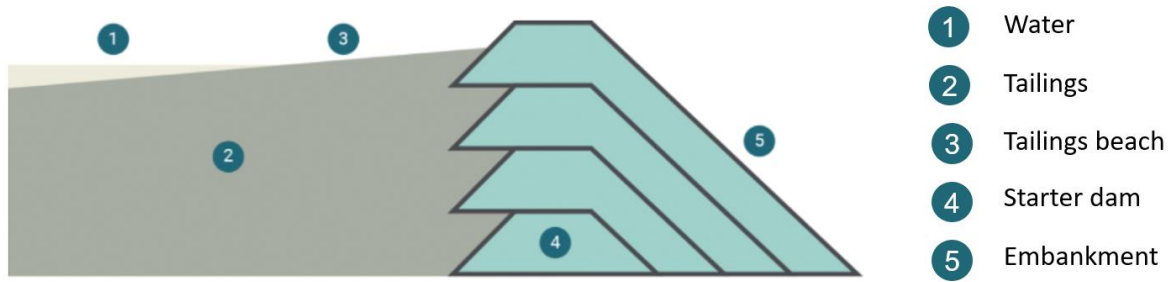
Centerline tailings dam construction (Global Tailings Review, 2020).
